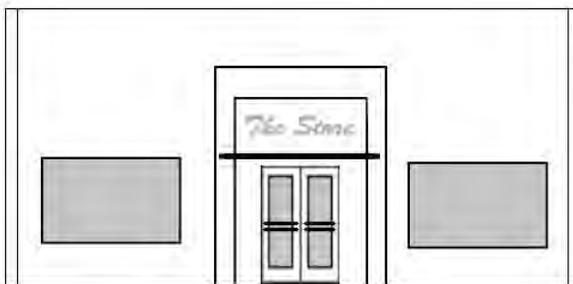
C: A secondary internal panel surrounding the door, possibly offset with color or materials, provides additional vertical character while improving the sense of entry too.
